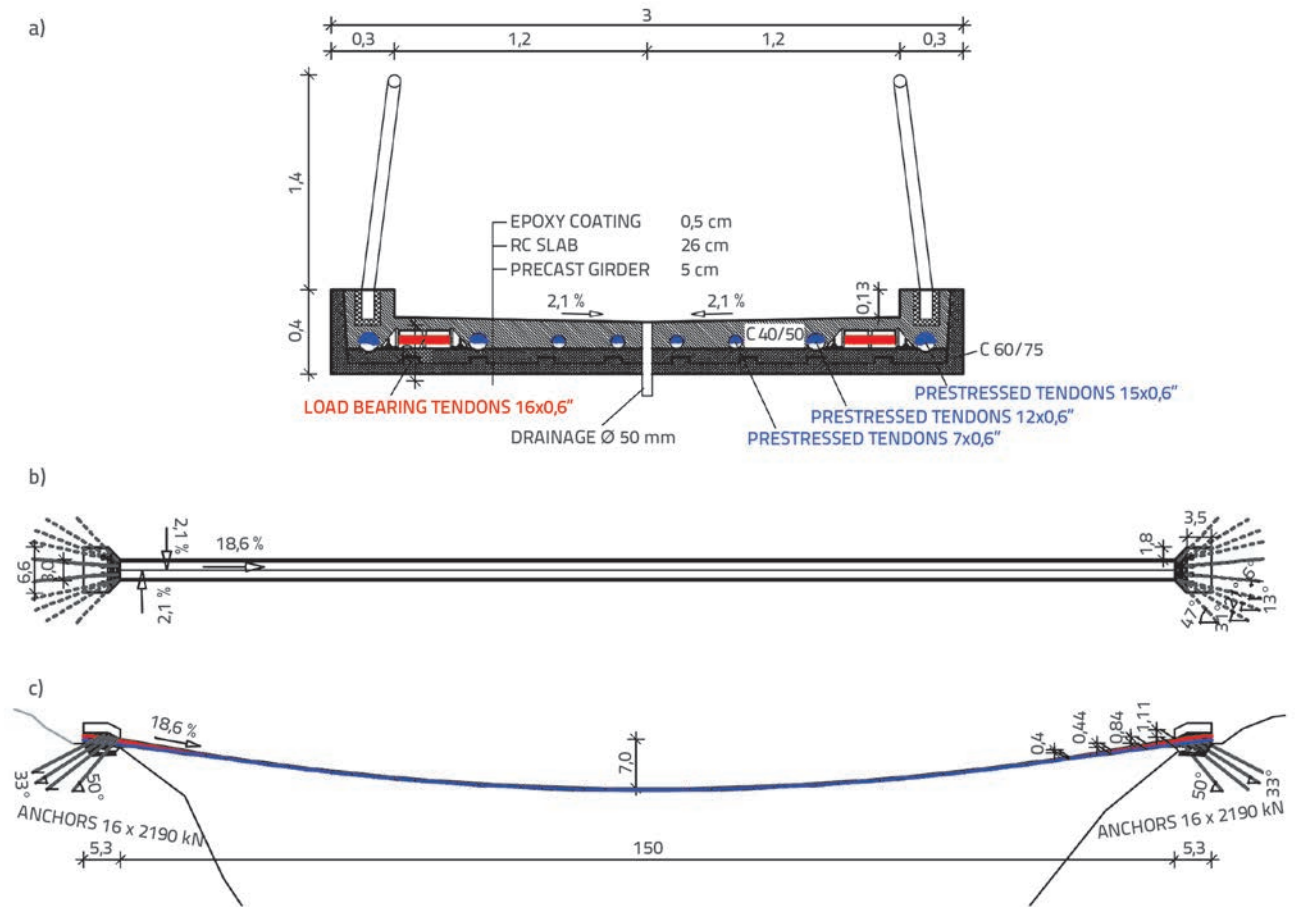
Basic solutions of stress-ribbon bridge over the Cetina at Zadvarje: a) mid-span cross section; b) plan view; c) longitudinal view
